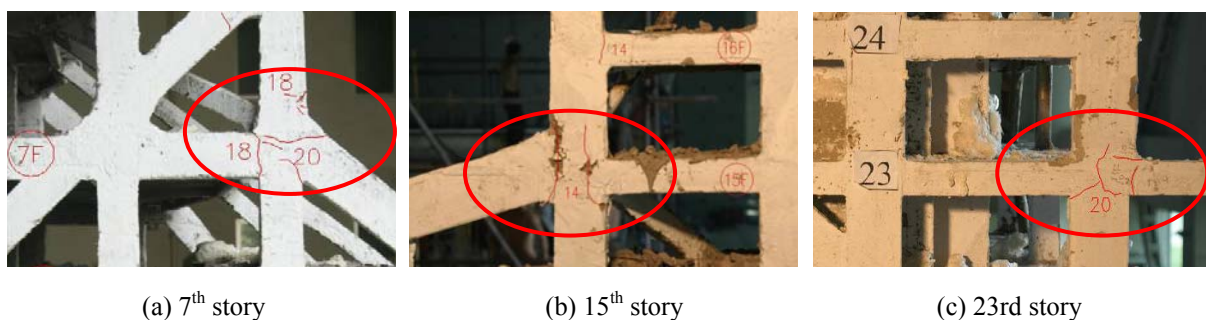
Cracks appeared at the internal corner joint where the plan was reduced
